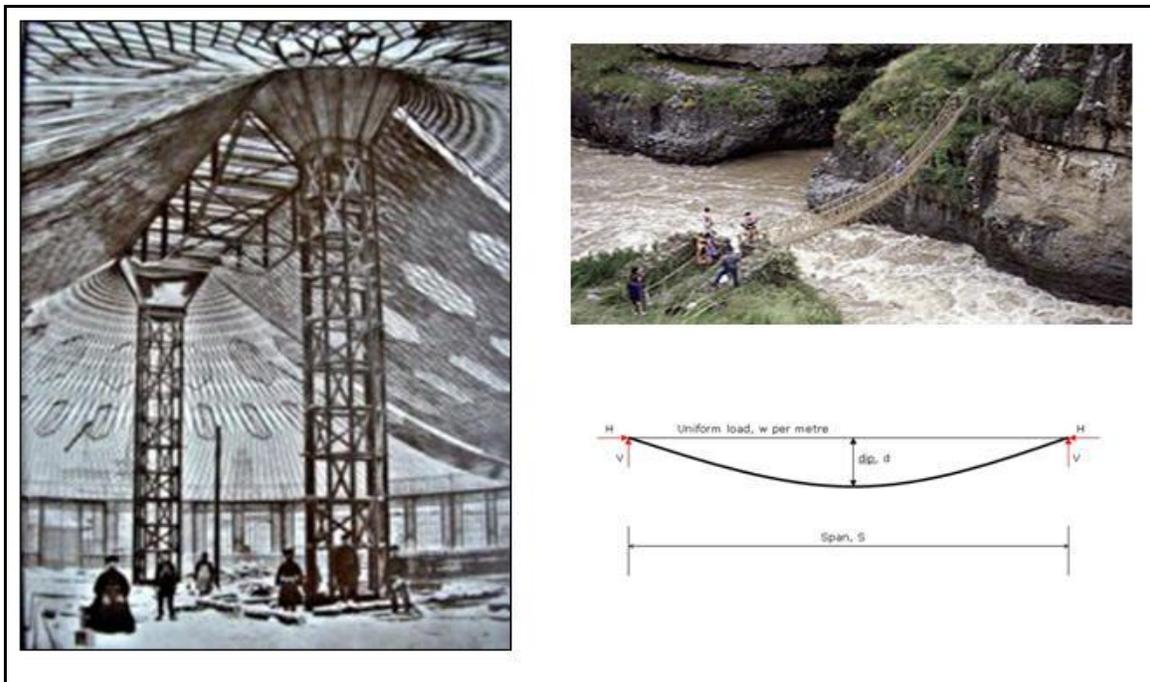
Examples of fabrics in construction. The left hand panel shows the Oval Pavilion from the 1896 World's Fair, while the right-hand panels show the simple idea of using a rope structure to carry a load across a span.
